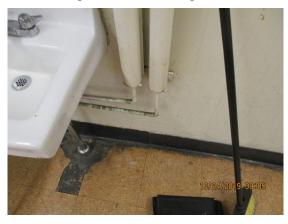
Exposed Ends and Cracking Insulation Wide View 1
